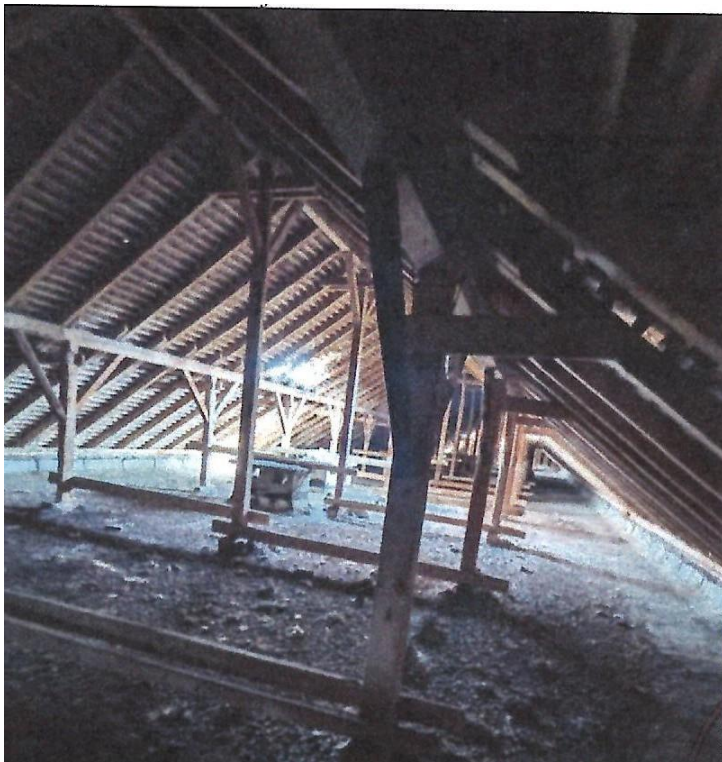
Photo from the attic , one can see the shoring props, panels and rafters spaced at 70 cm
